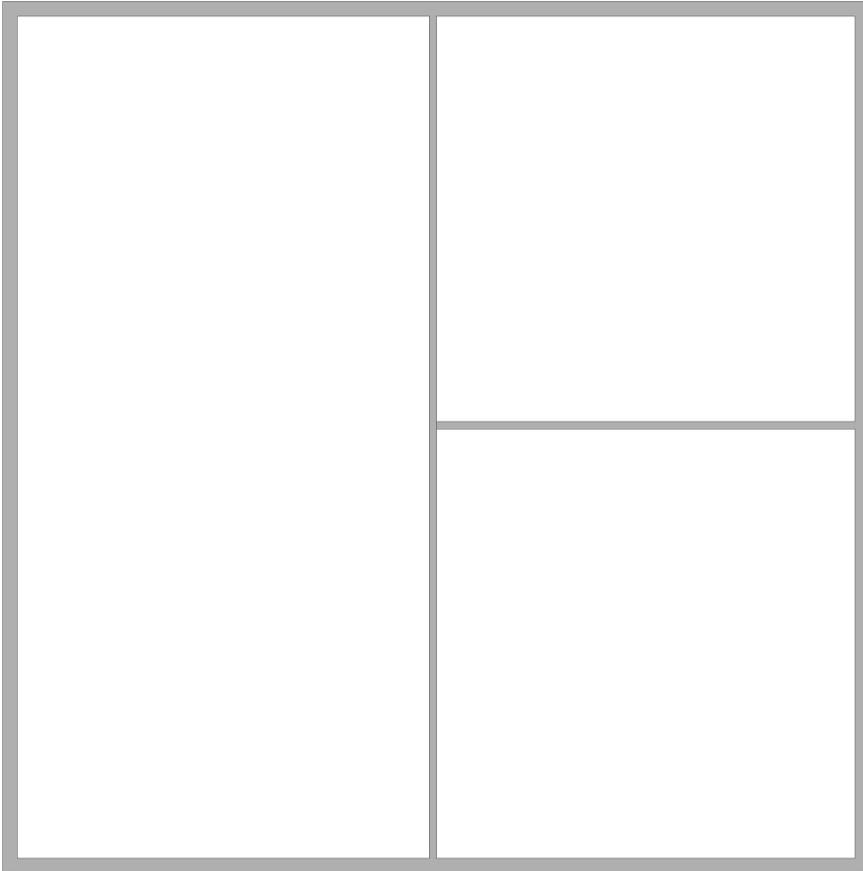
Floor plan of a building with three rooms: the drawing consists of just the walls but the rooms are also instantly recognizable
